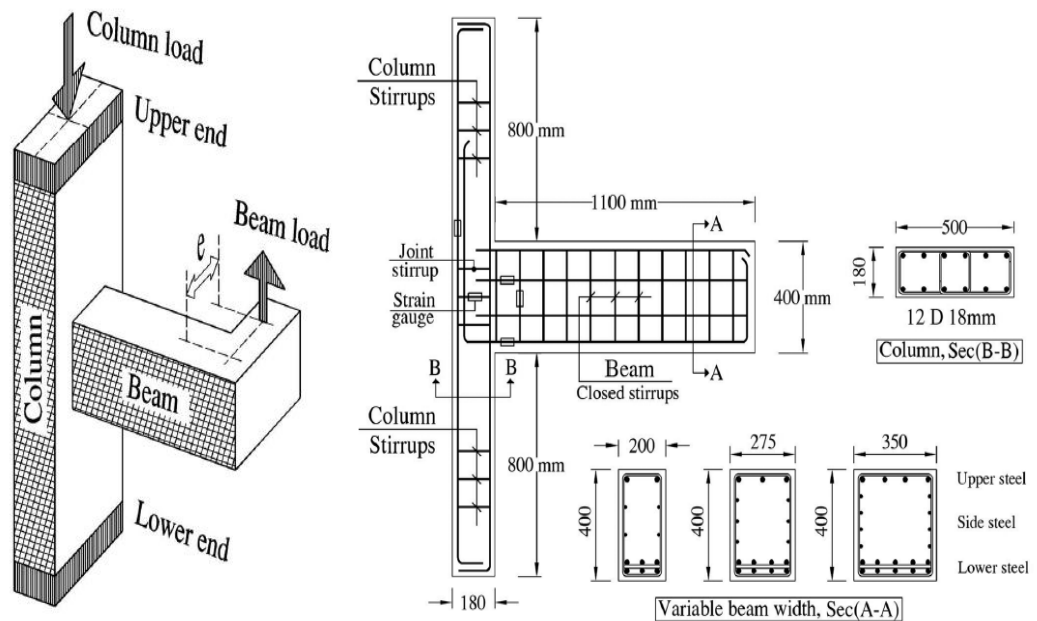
Test and specimen details (Elshafiey et al., 2016)
